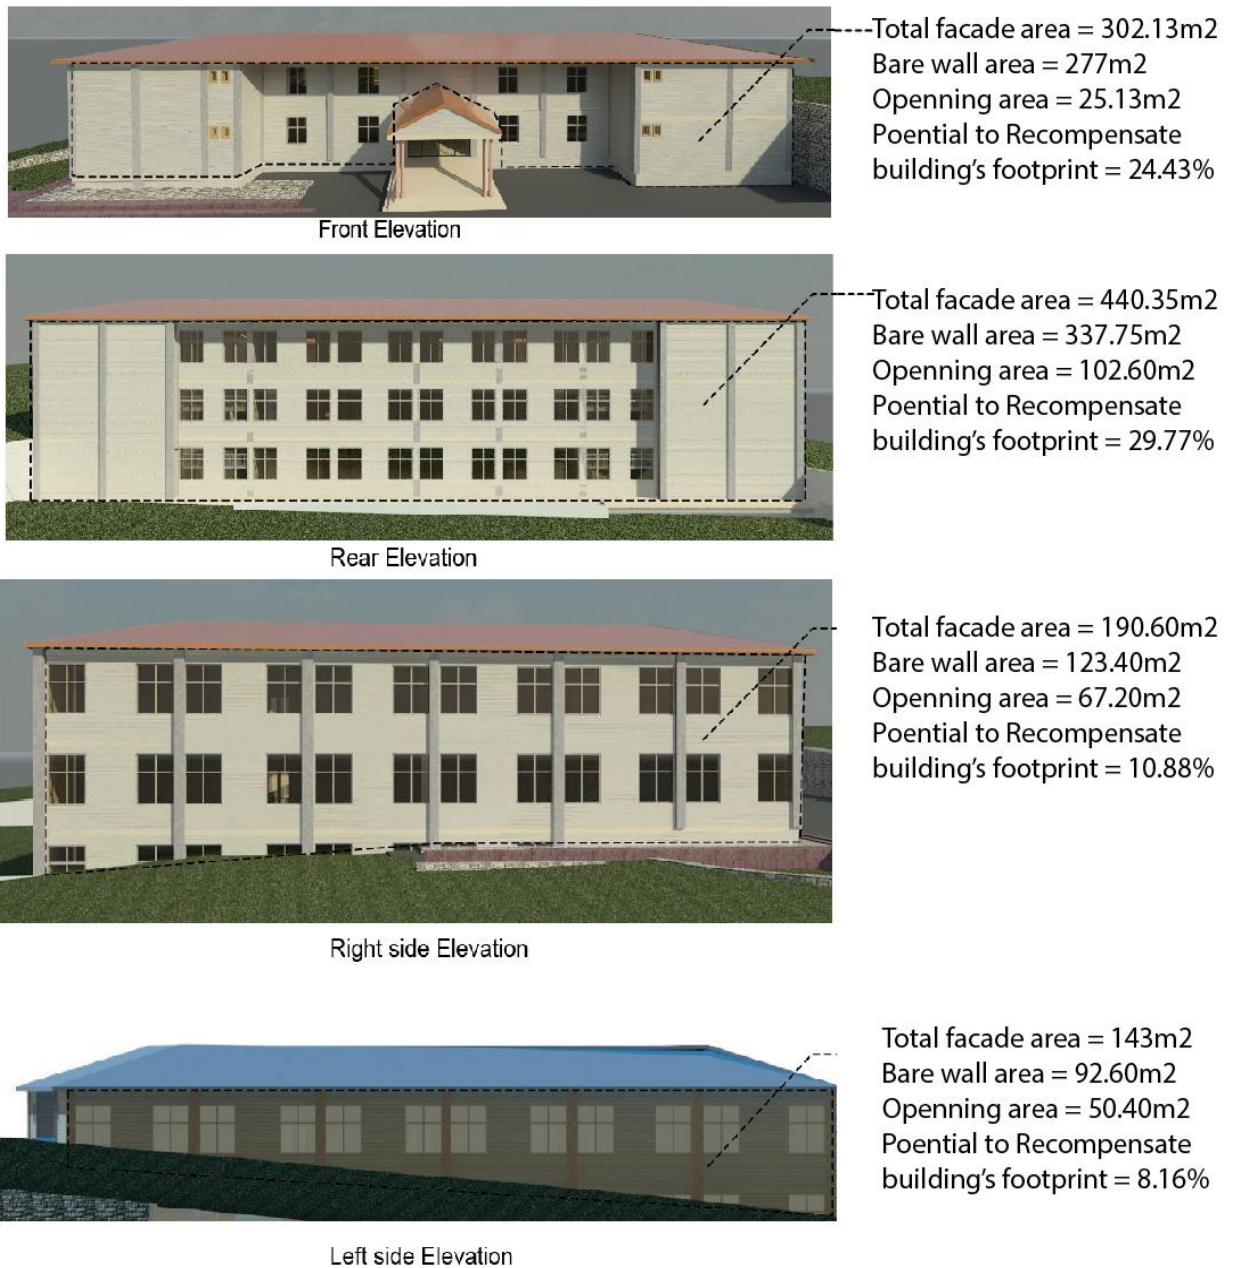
External surfaces bare wall potentials of the Urban building, (Source: Author)
